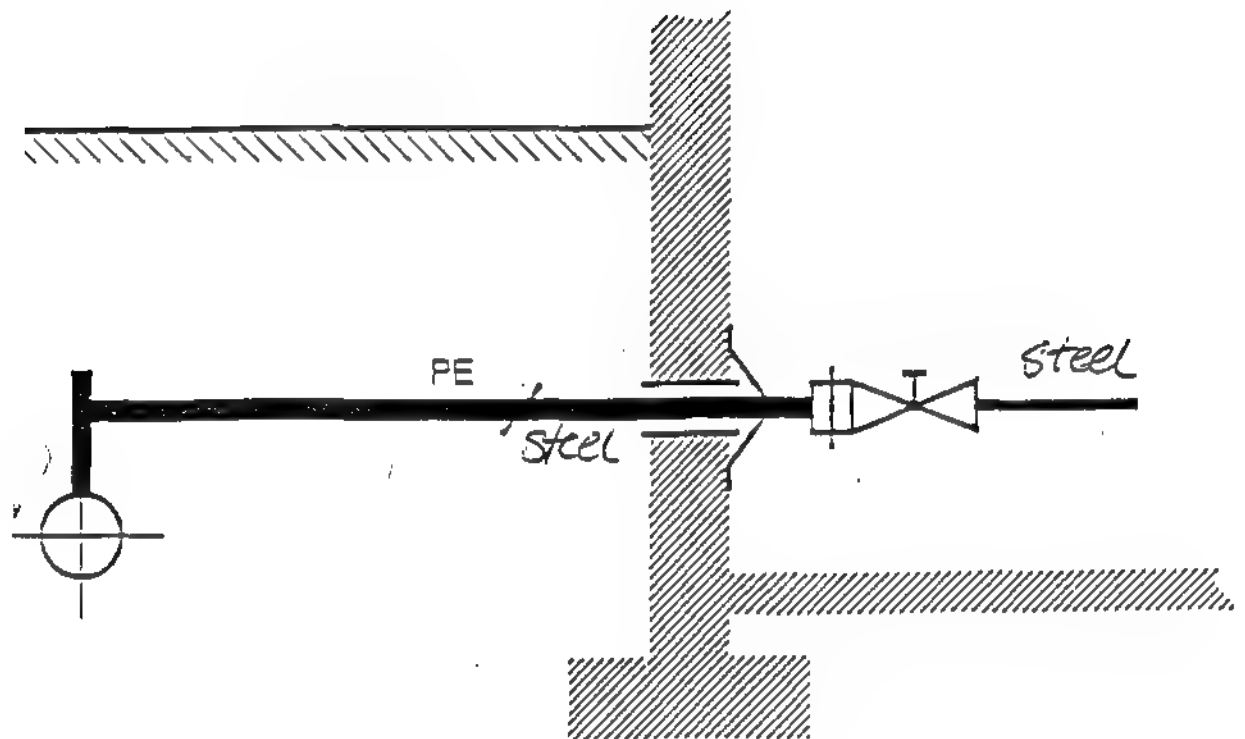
No insulating joint in house-connection line; house-connection line made of PE - wall entrance unit
